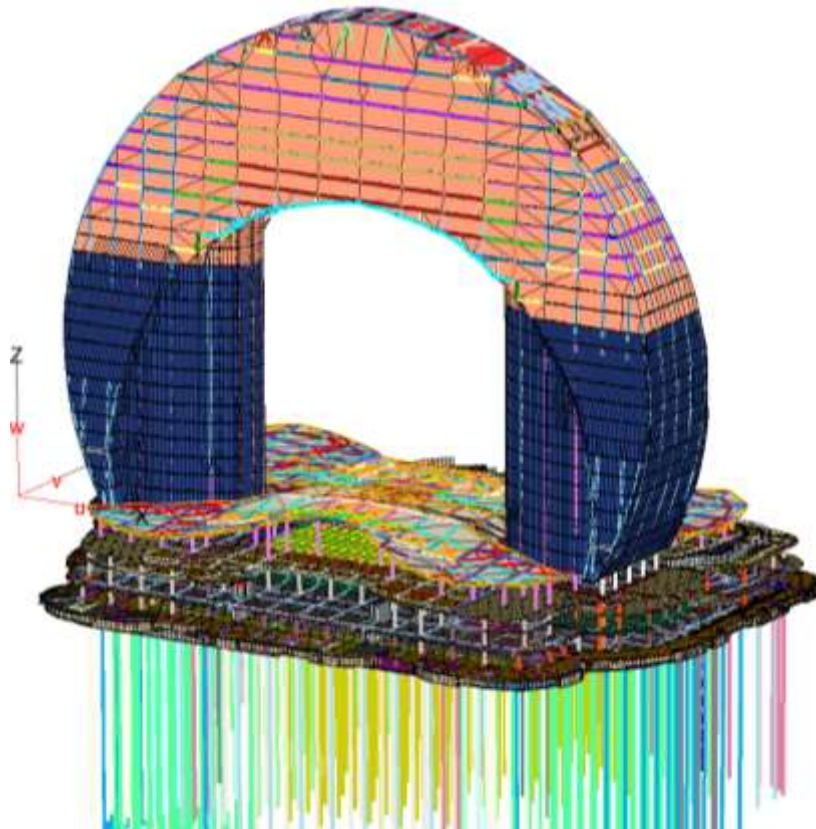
A finite element model of a multi-storey building of complex shape [15]
